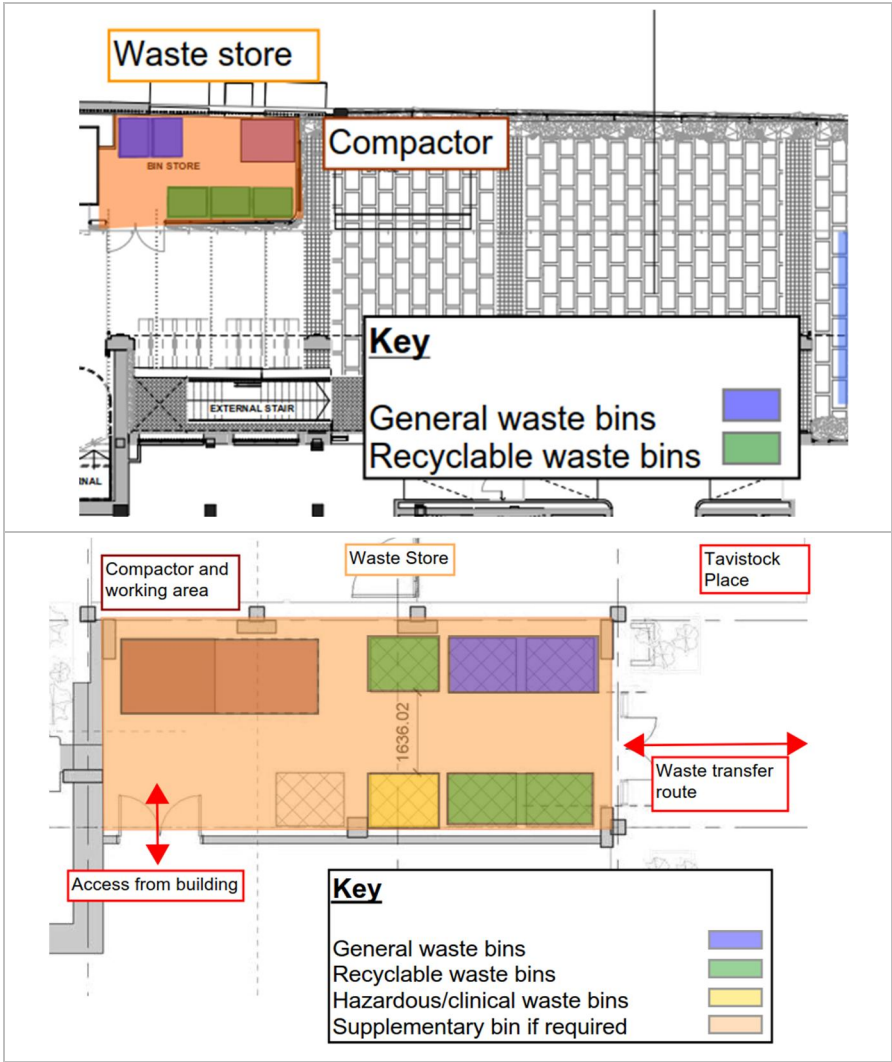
Tavis House – Approved scheme Waste Store layout (top) and proposed layout (bottom - Two-day storage)
